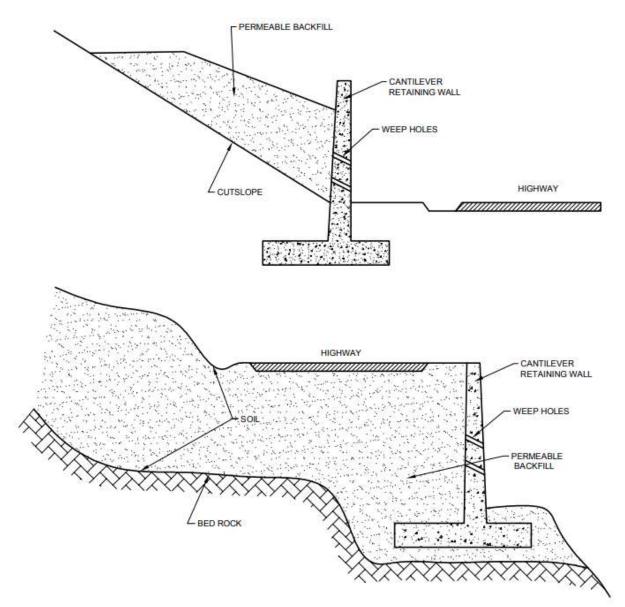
SCHEMATIC DIAGRAM OF RCC CANTILEVER RETAINING WALL
